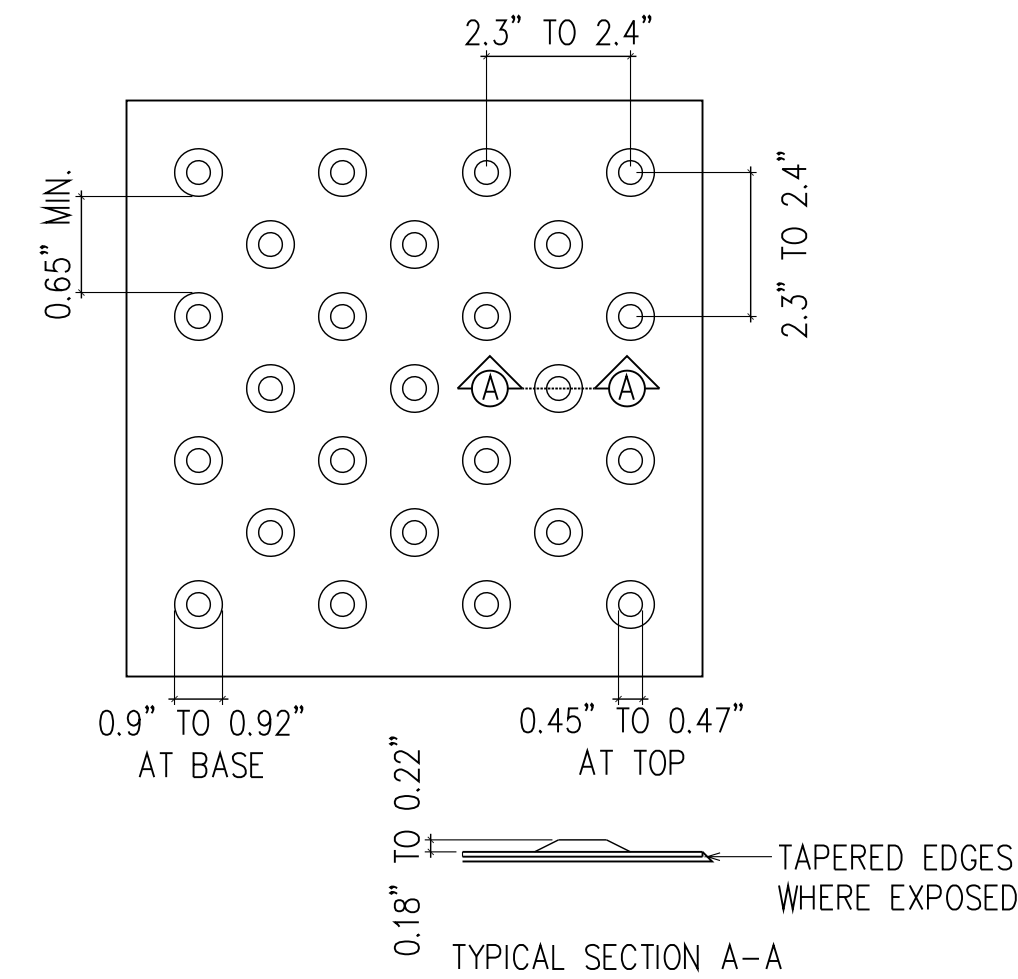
B-705.1 CBC 2016 SIZE & SPACING OF TRUNCATED DOMES
